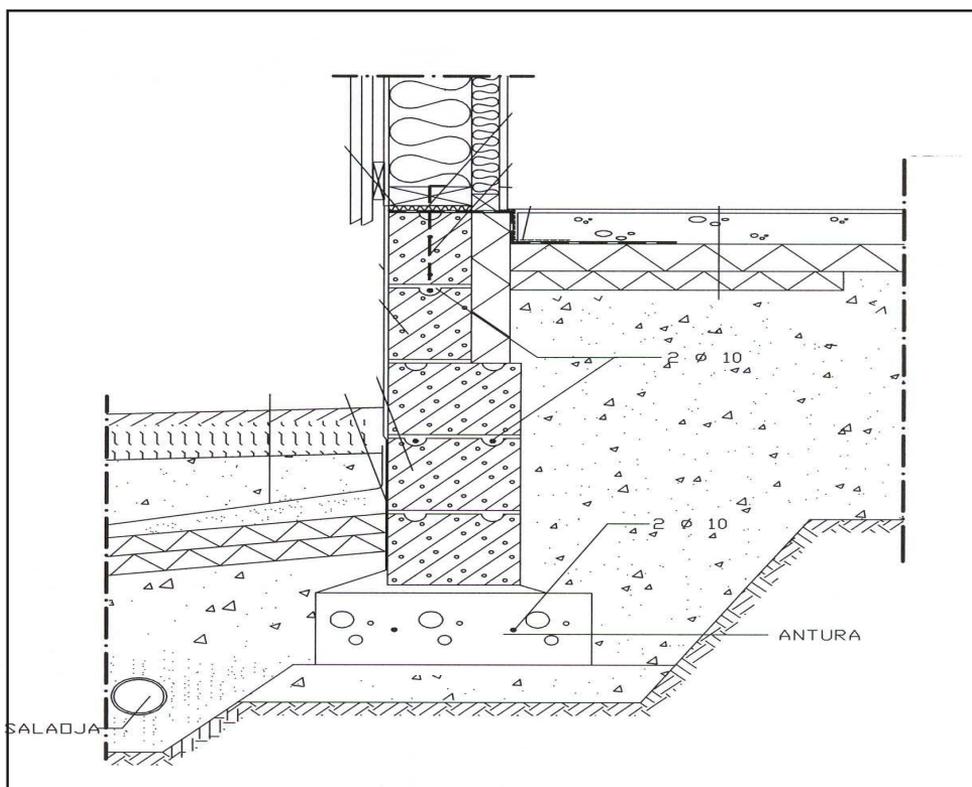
Installation of bitumen felt to the joint of foundation wall and floor slab.
